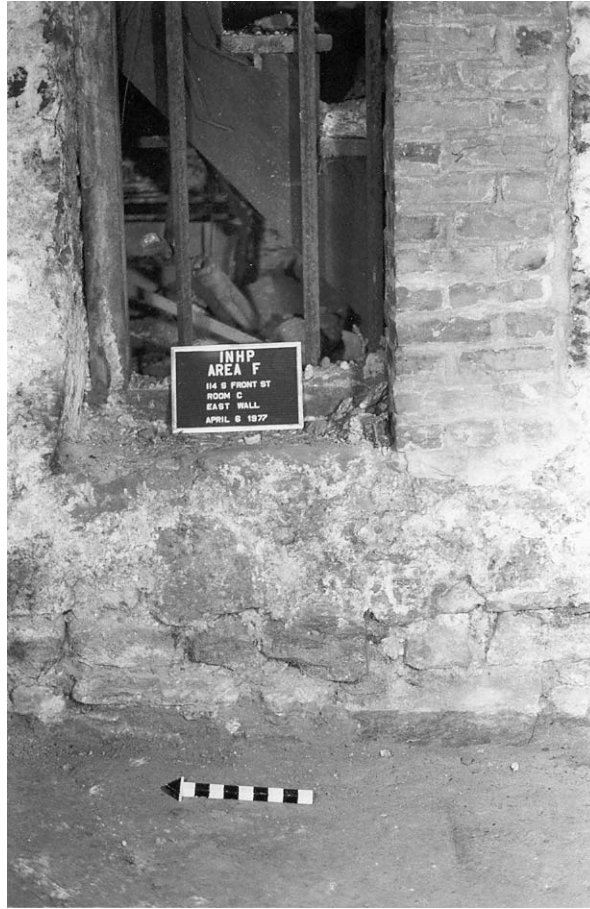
Area F, 114 S. Front Street, Room C, east wall. Note barred window, partially filled in with brick; view east into Room B.
